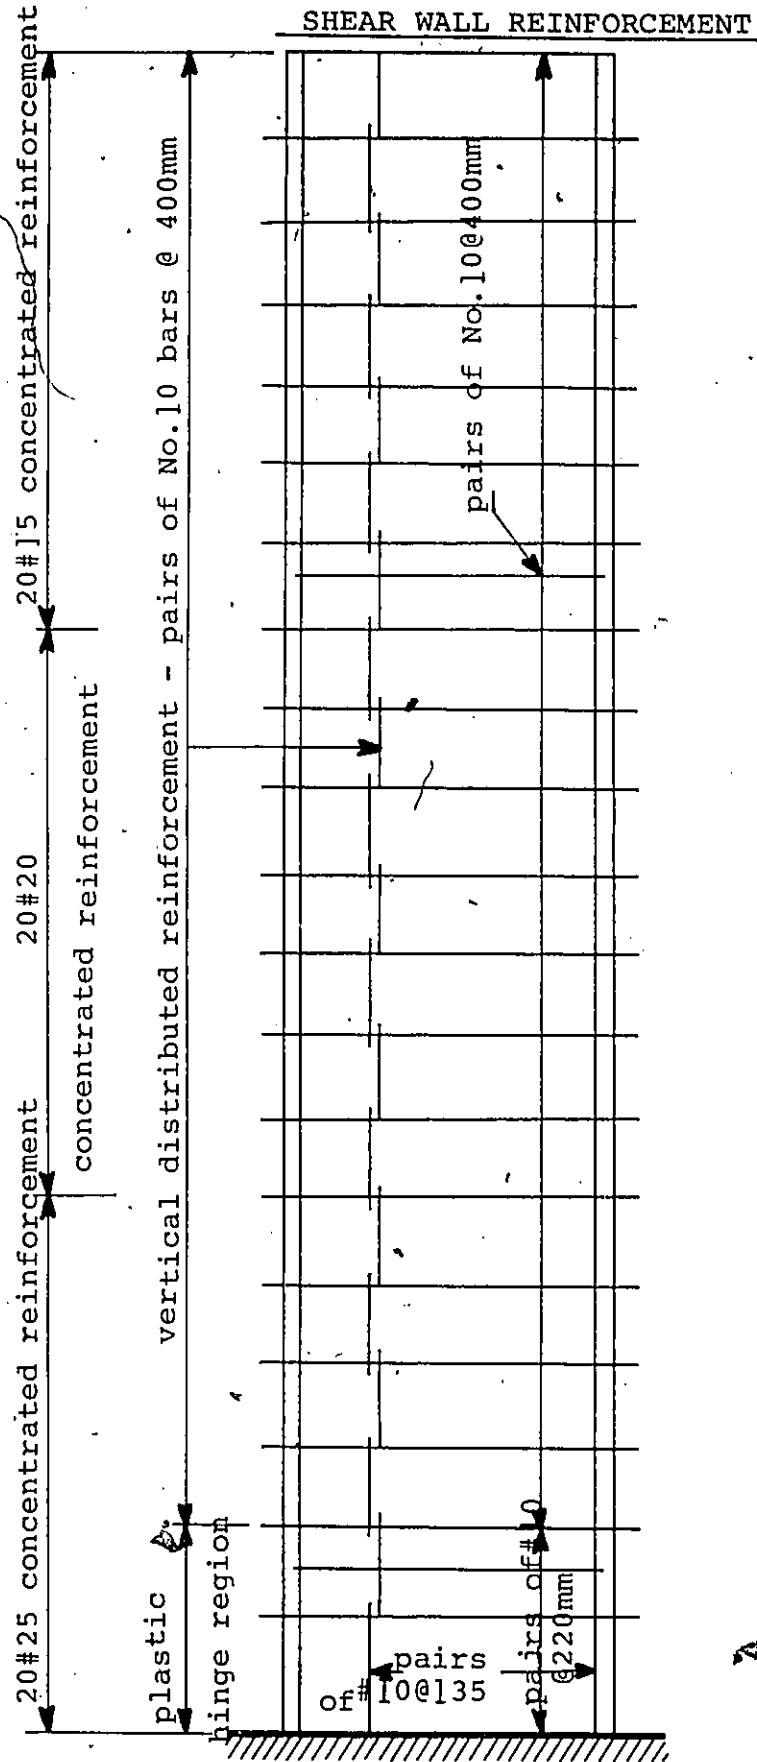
Reinforcement Details (CAN3-A23.3-M84)
